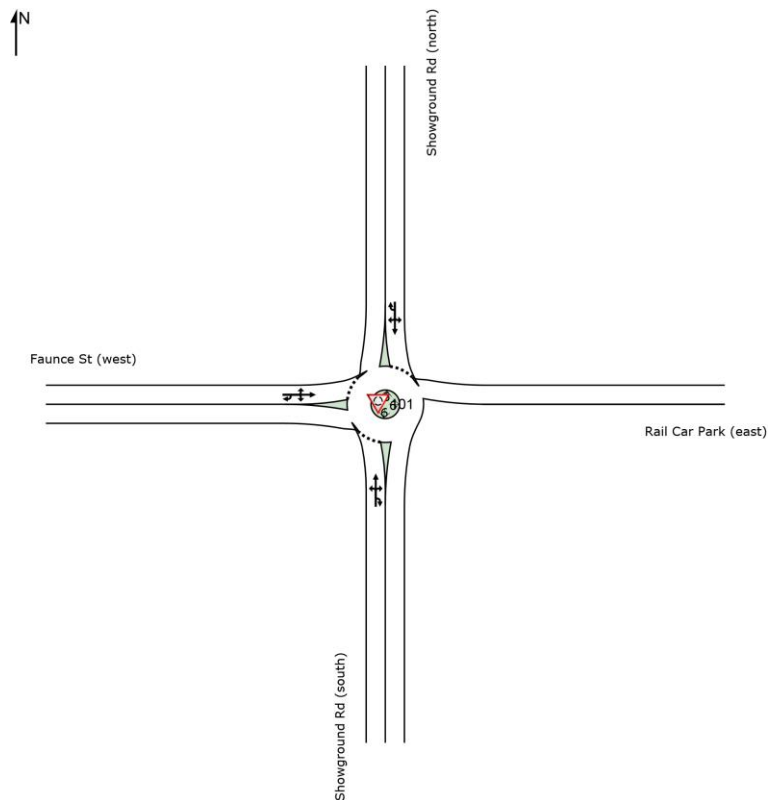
Existing Intersection Layout – Showground Rd / Faunce St
